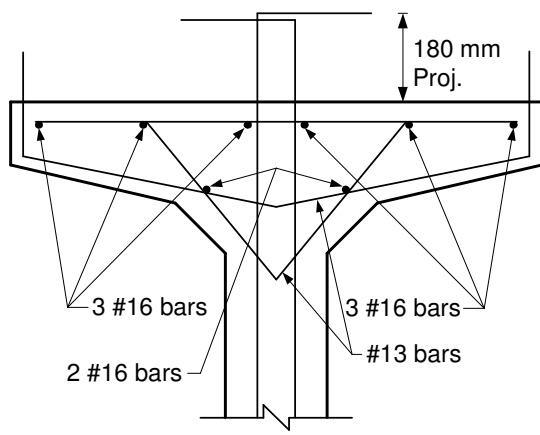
Longitudinal Reinforcement of Girder Top Flange
